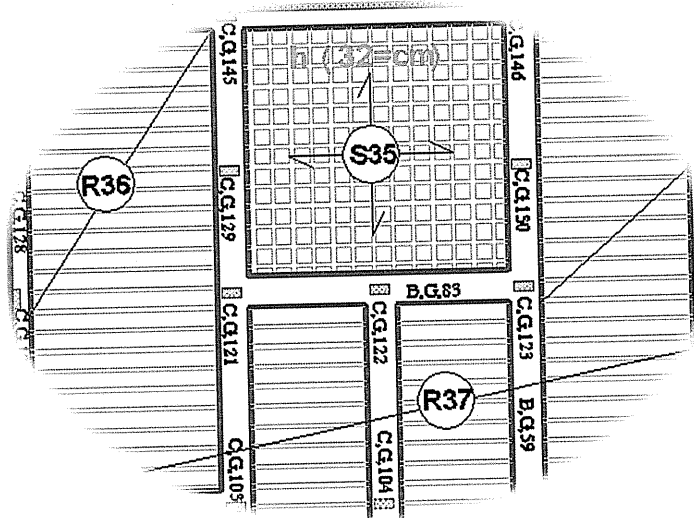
One Way Ribbed Slab (R37) and Two Way Ribbed Slab (S35)
